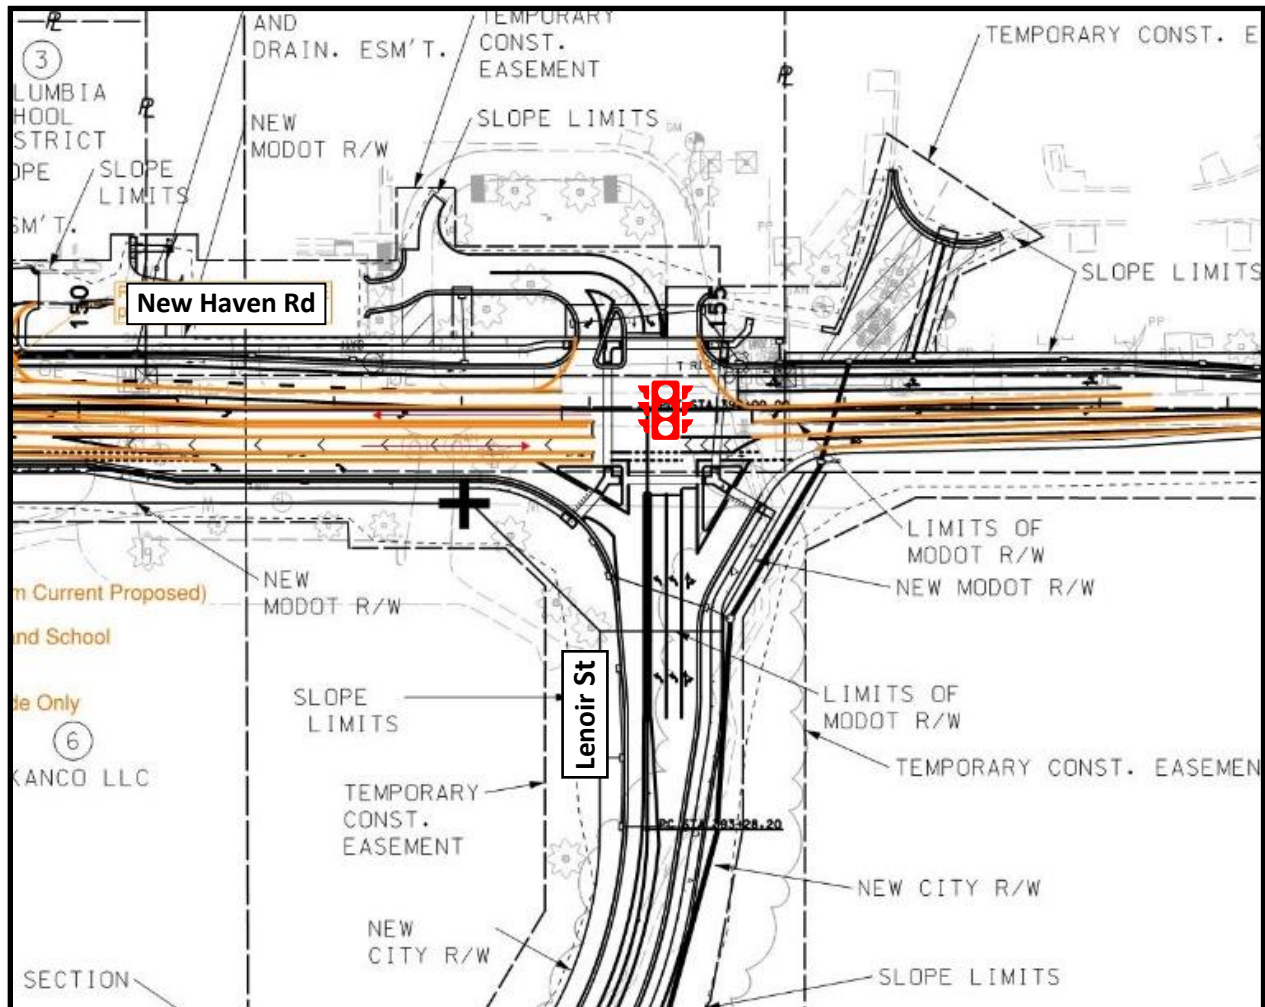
Proposed Intersection Configuration for New Haven Road and Lenoir Street (provided by MoDOT)
